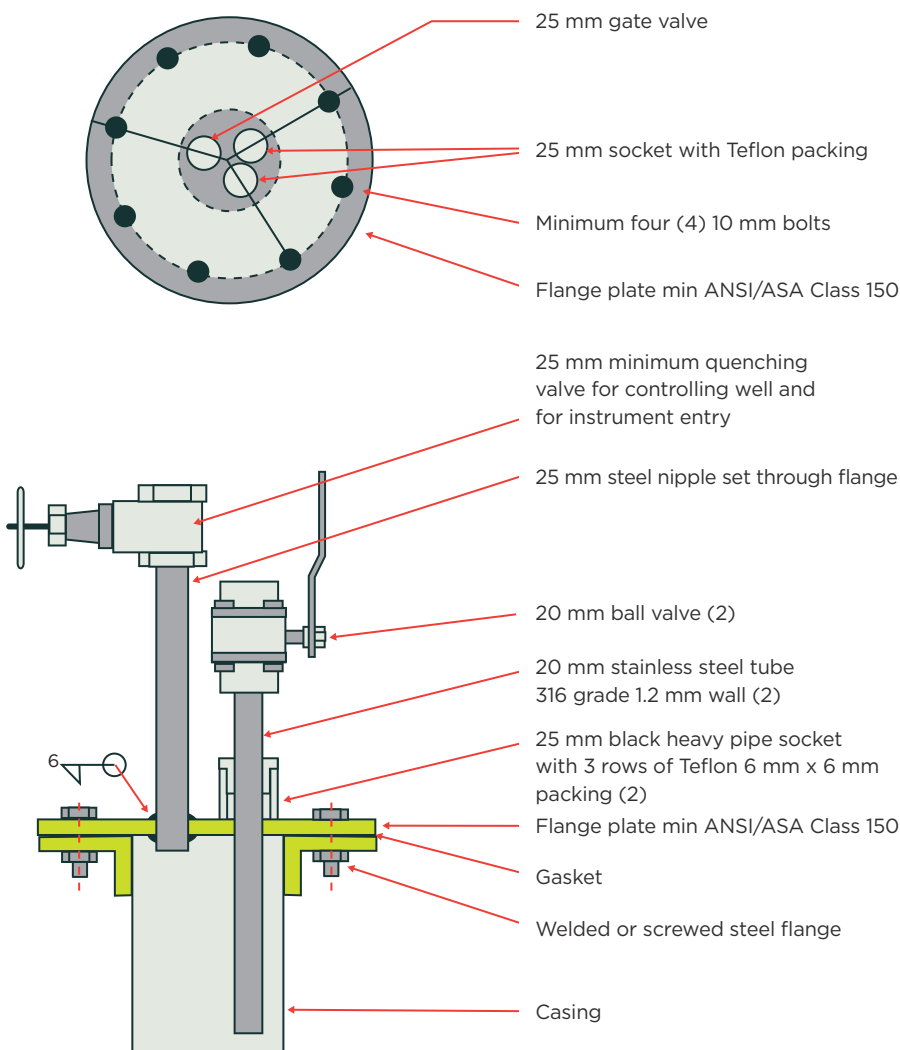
Wellhead construction details for a downhole heat exchanger using stainless steel tube (20 mm stainless steel tube illustrated)
